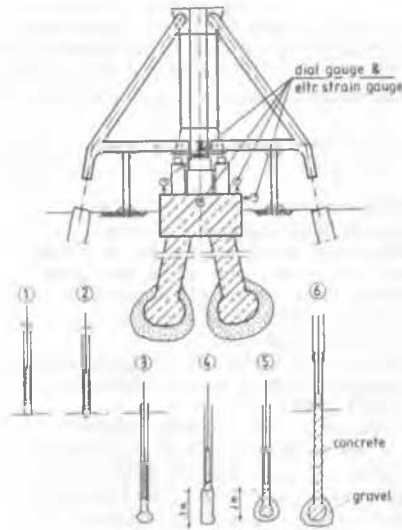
Schematic test arrangement and Generation of the cast-in-place concrete piles, type Franki
